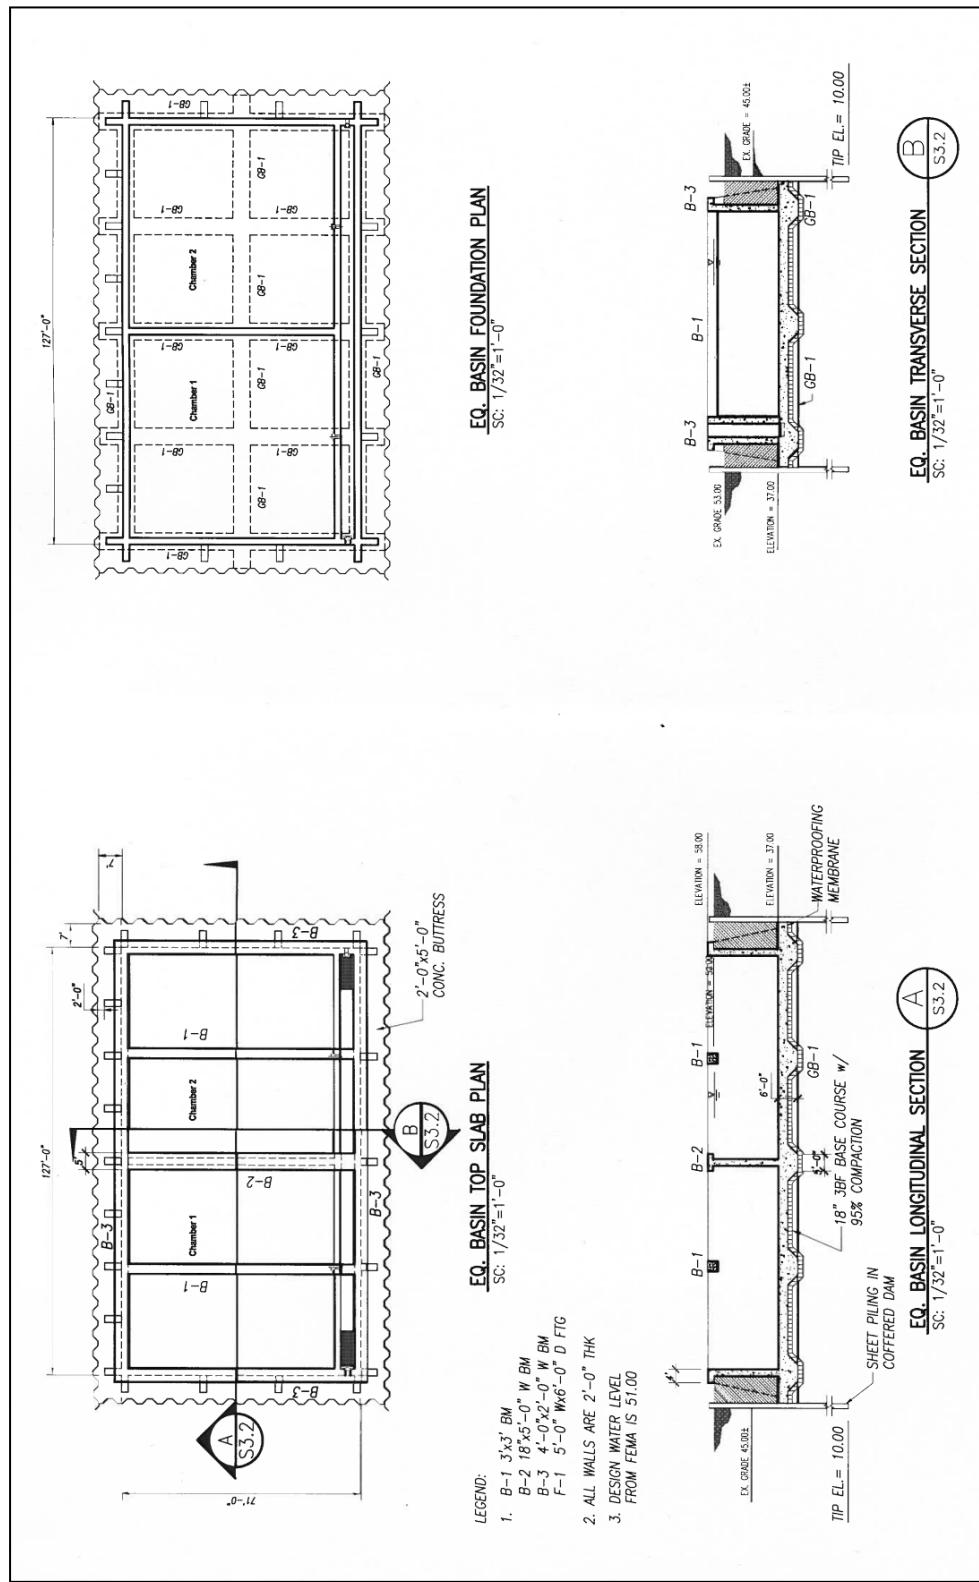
Option 2: Structural Foundation – 1 MG EQ Basin at Ex. Storage Tank Site
